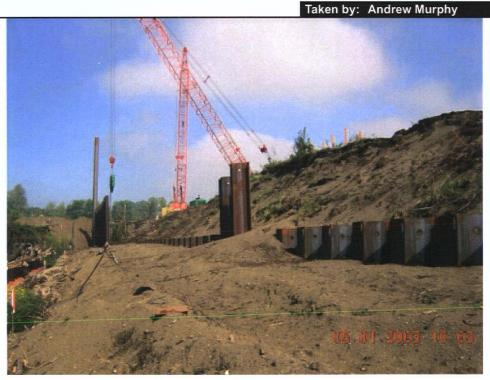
View of bank erosion at southeast bank. Direction: Northwest
